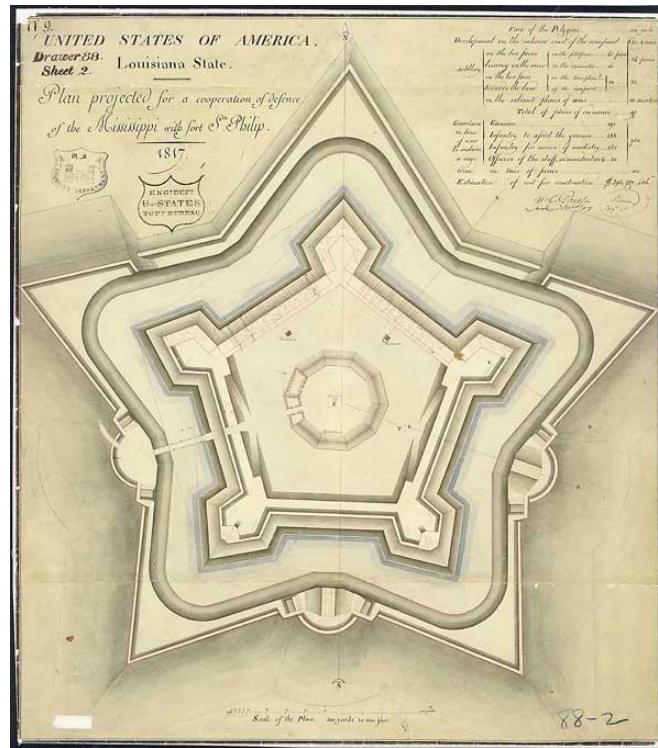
Plan of Fort Jackson*, Guillaume Tell Poussin, 1817.
